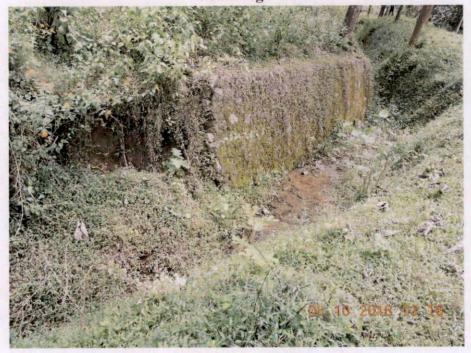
Stone pitched Elephant-proof Trench at Golur, Muthanga
